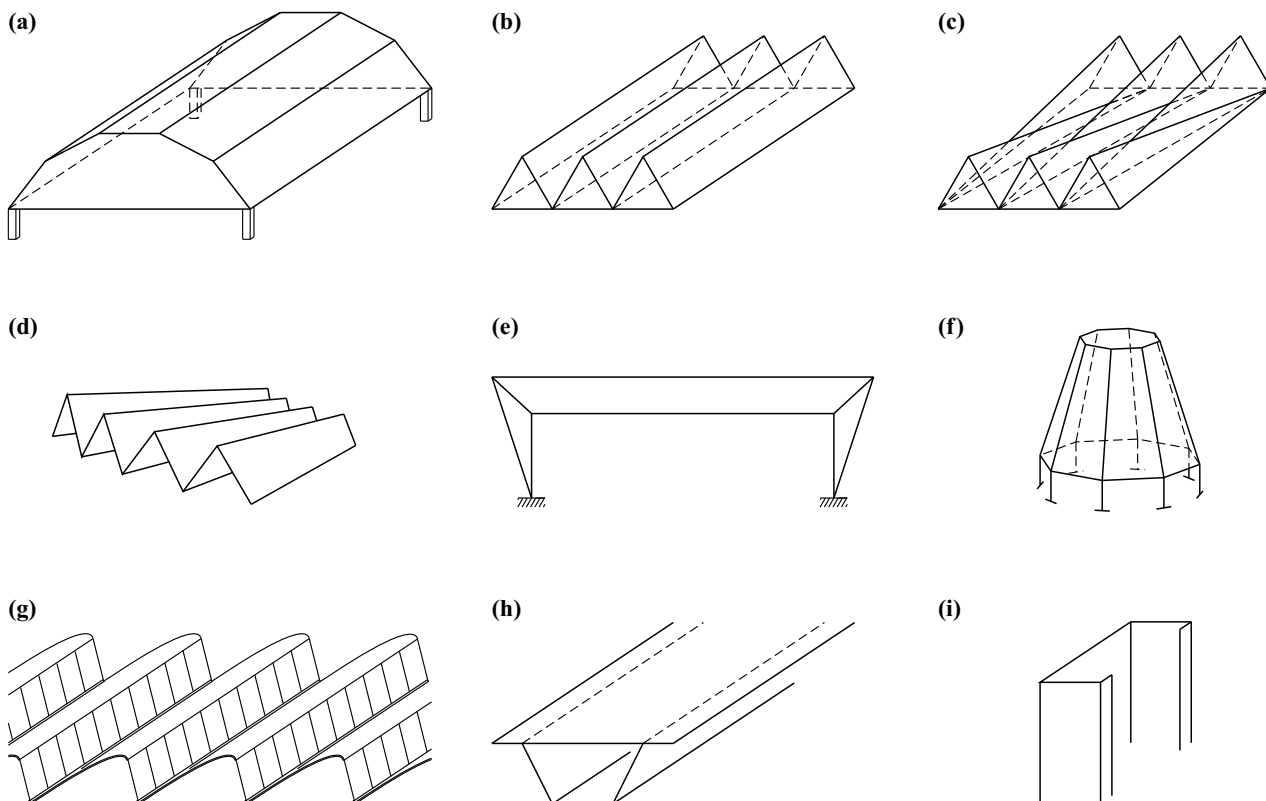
Folded plates: (a) barrel vault, (b) to (d) sawtooth roofs, (e) frame-type folded plate, (f) cooling tower, (g) northlight roof, (h) box girder, (i) service core
